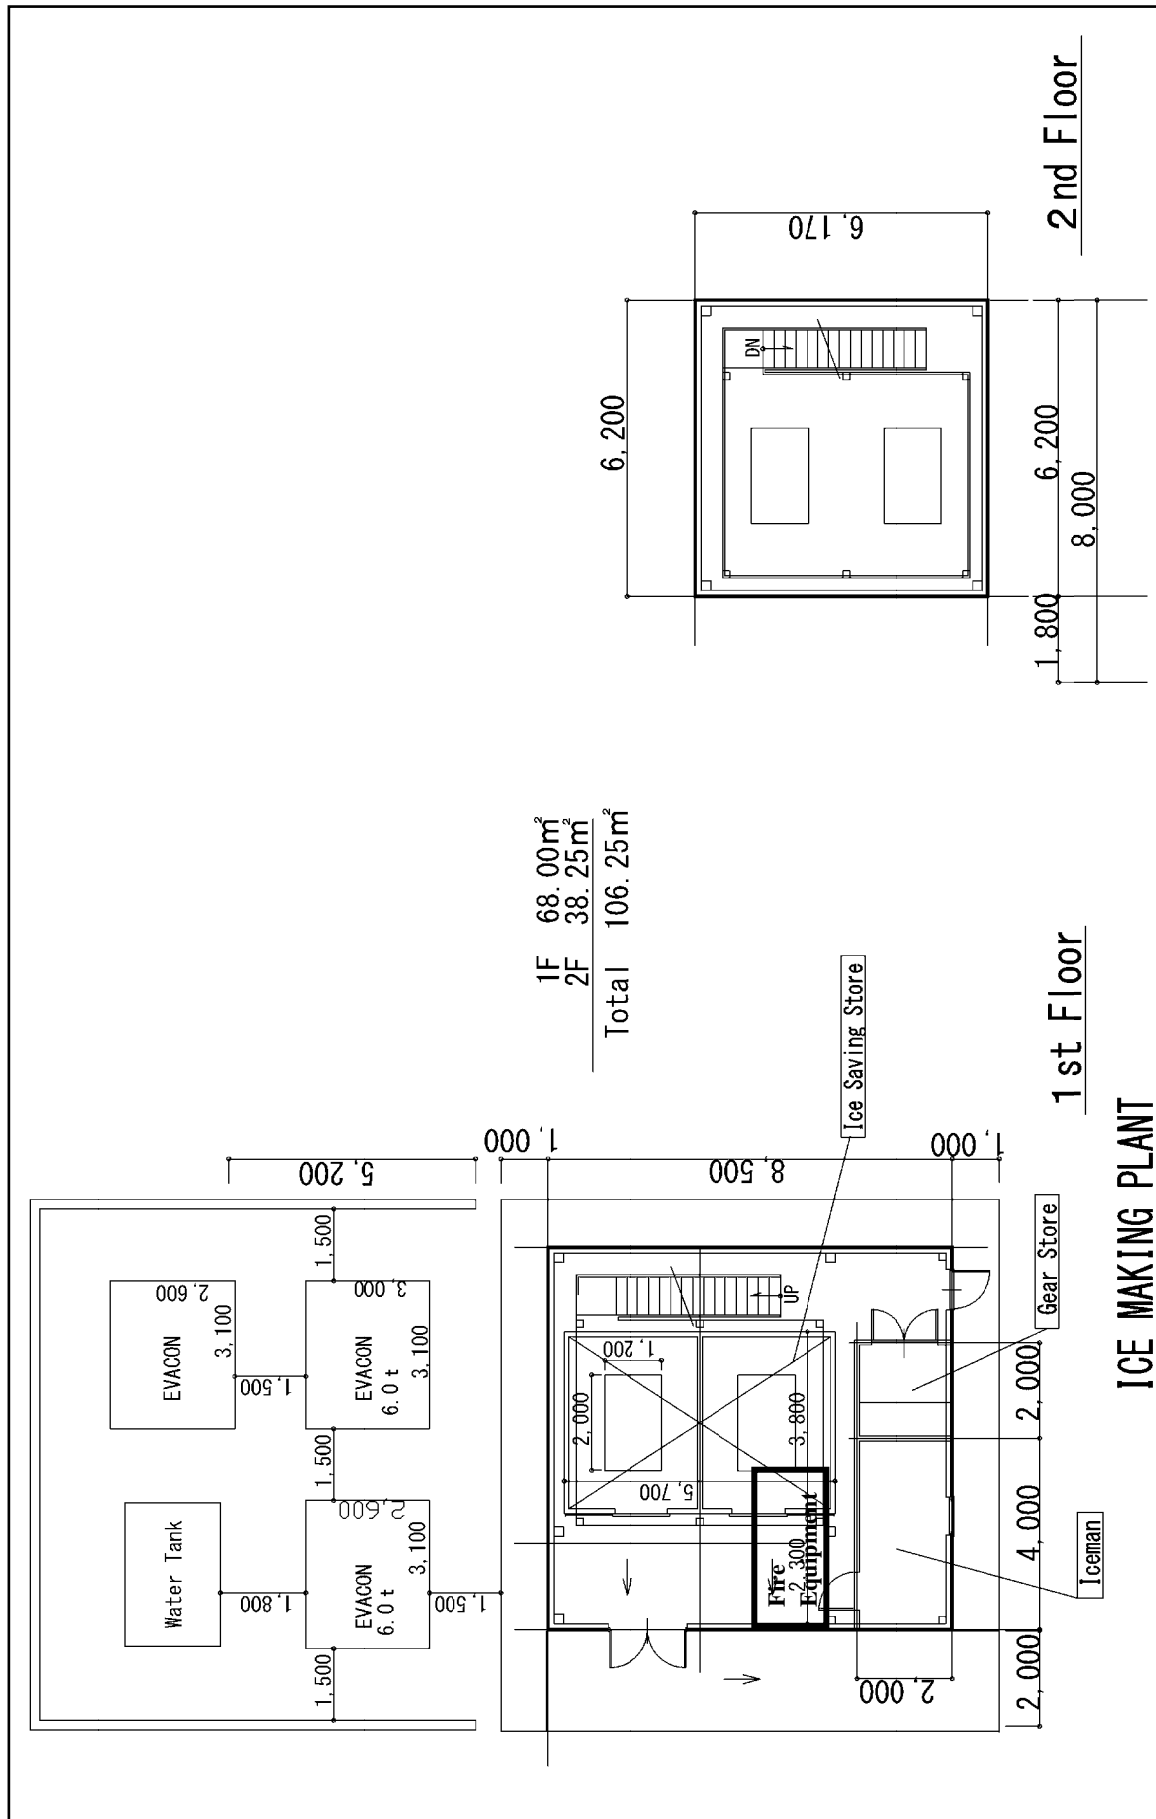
(4) Location of Fire-Extinguishing Equipment (Ice Plant at Bel Ombre)
